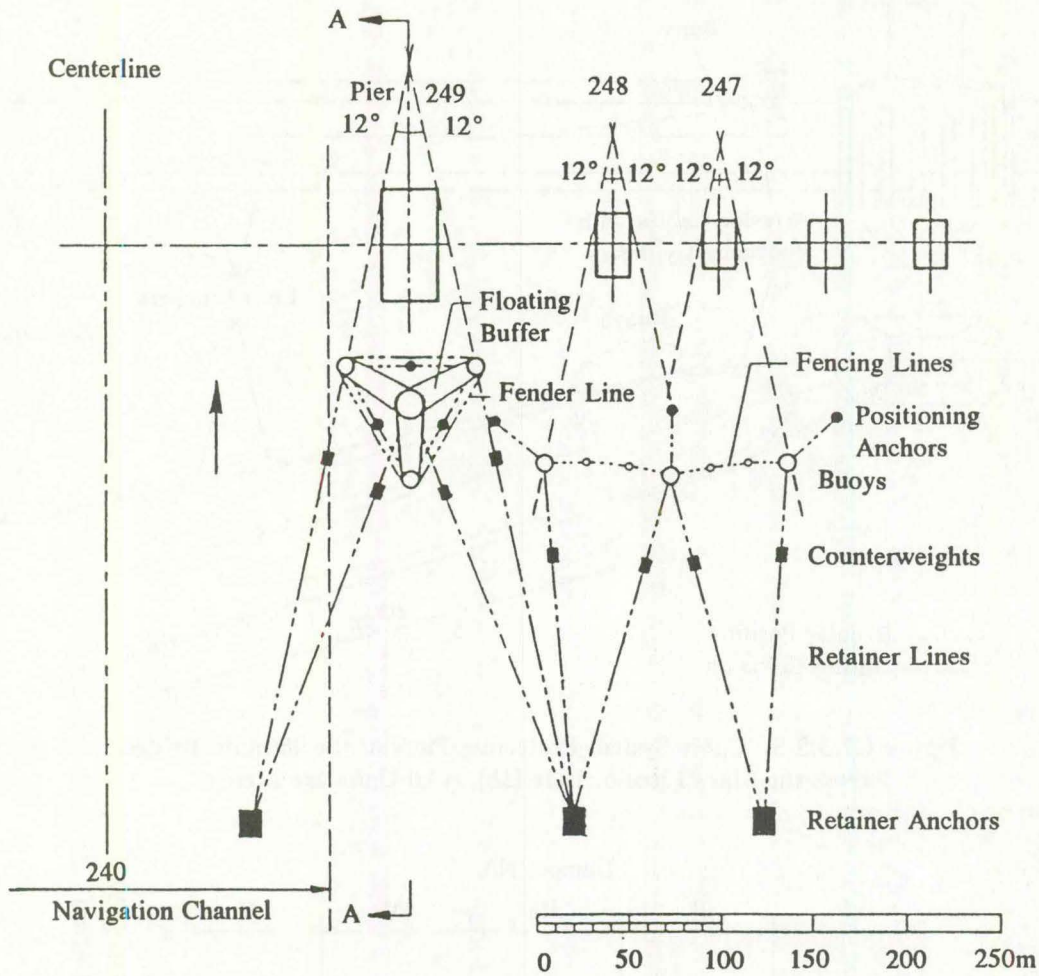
Plan of Anchored Pontoon (Floating Buffer) Protection System Evaluated for use on the Zarate-Brazo Largo Bridge, Argentina [32]. (All Units are Metric)
